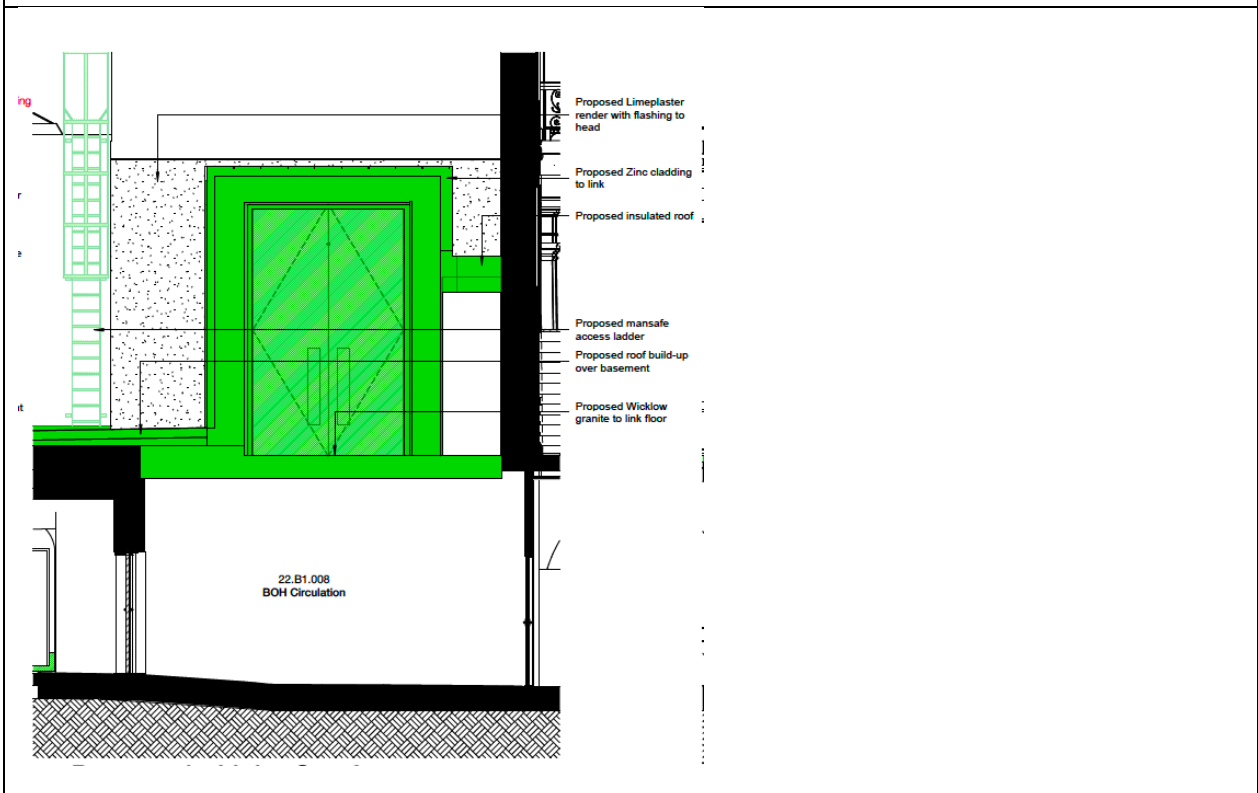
Partial North-south proposed section with new fabric proposed in green with new door link. Snap of North-south section with new fabric in green. Not to scale. (Source HB drawing ref: PSL-HBA-HL-XX-DR-A-080819 – Rev P02)
